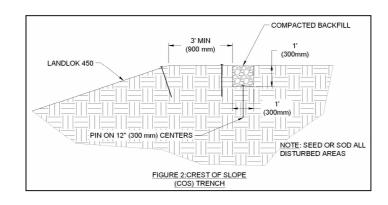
Crest of Slope (COS) Trench 4. Excavate a Toe of Slope (TOS) trench 12 in x 12 in (300 mm x 300 mm) minimum at a minimum distance
